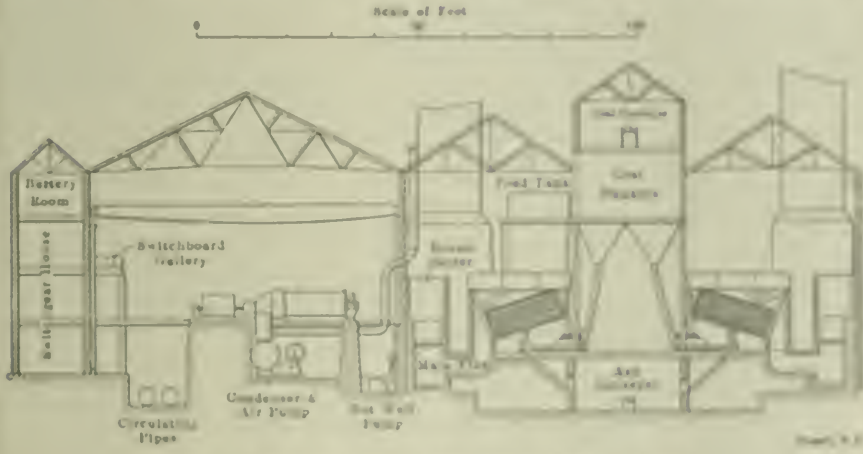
ELEVATION OF 10,000-KILOWATT STEAM PLANT
